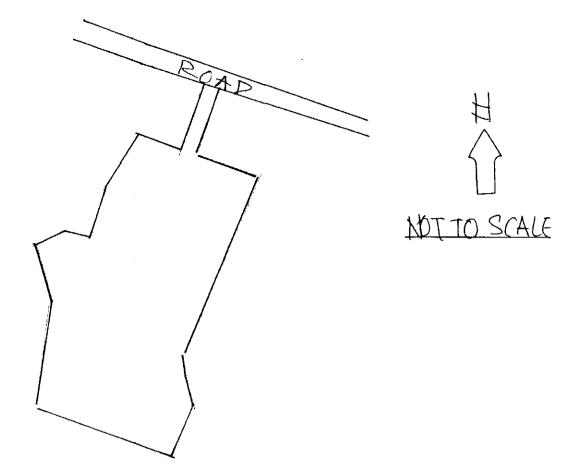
SITE PLAN OF PROPOSED HOUSING IN SY, NO. 202-206, KOWKUR (V) MALKAJIGIRI (M) R.R.DT.
